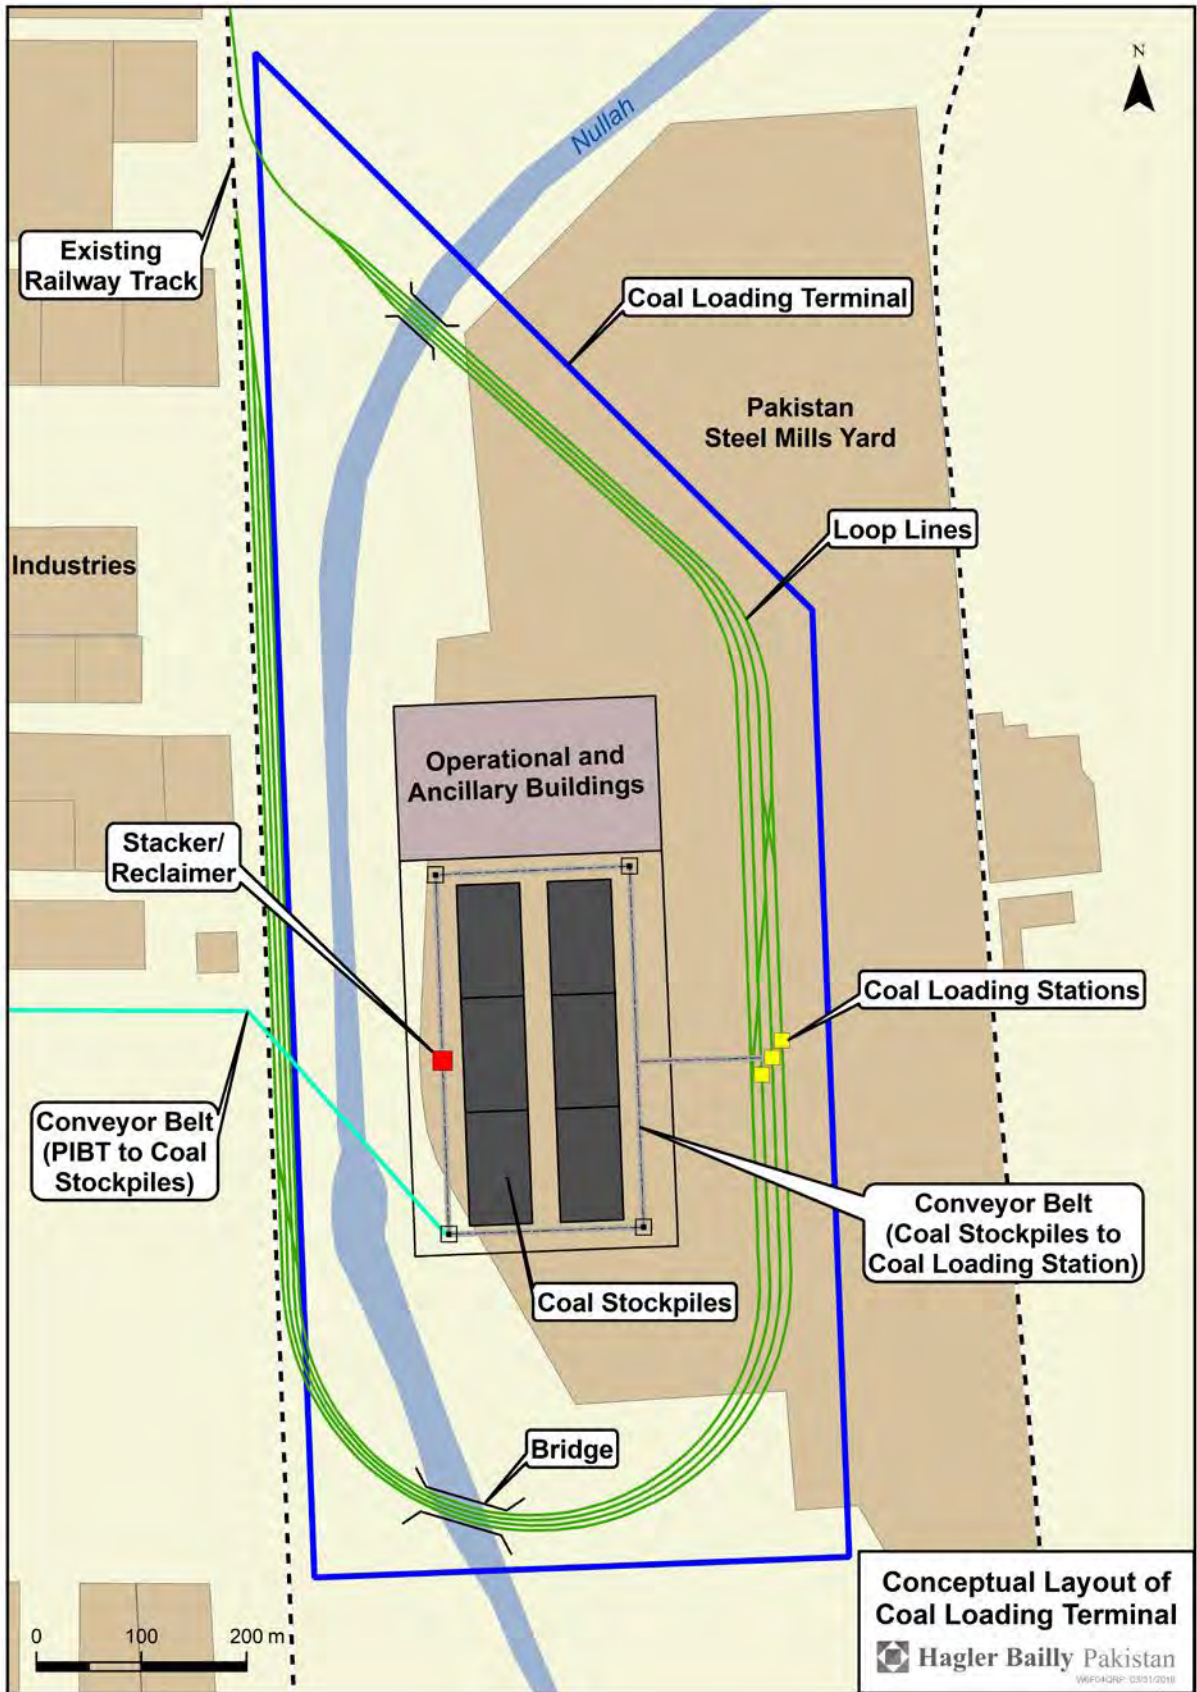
Figure III: Conceptual Layout of Project Infrastructure at the Coal Loading Terminal
